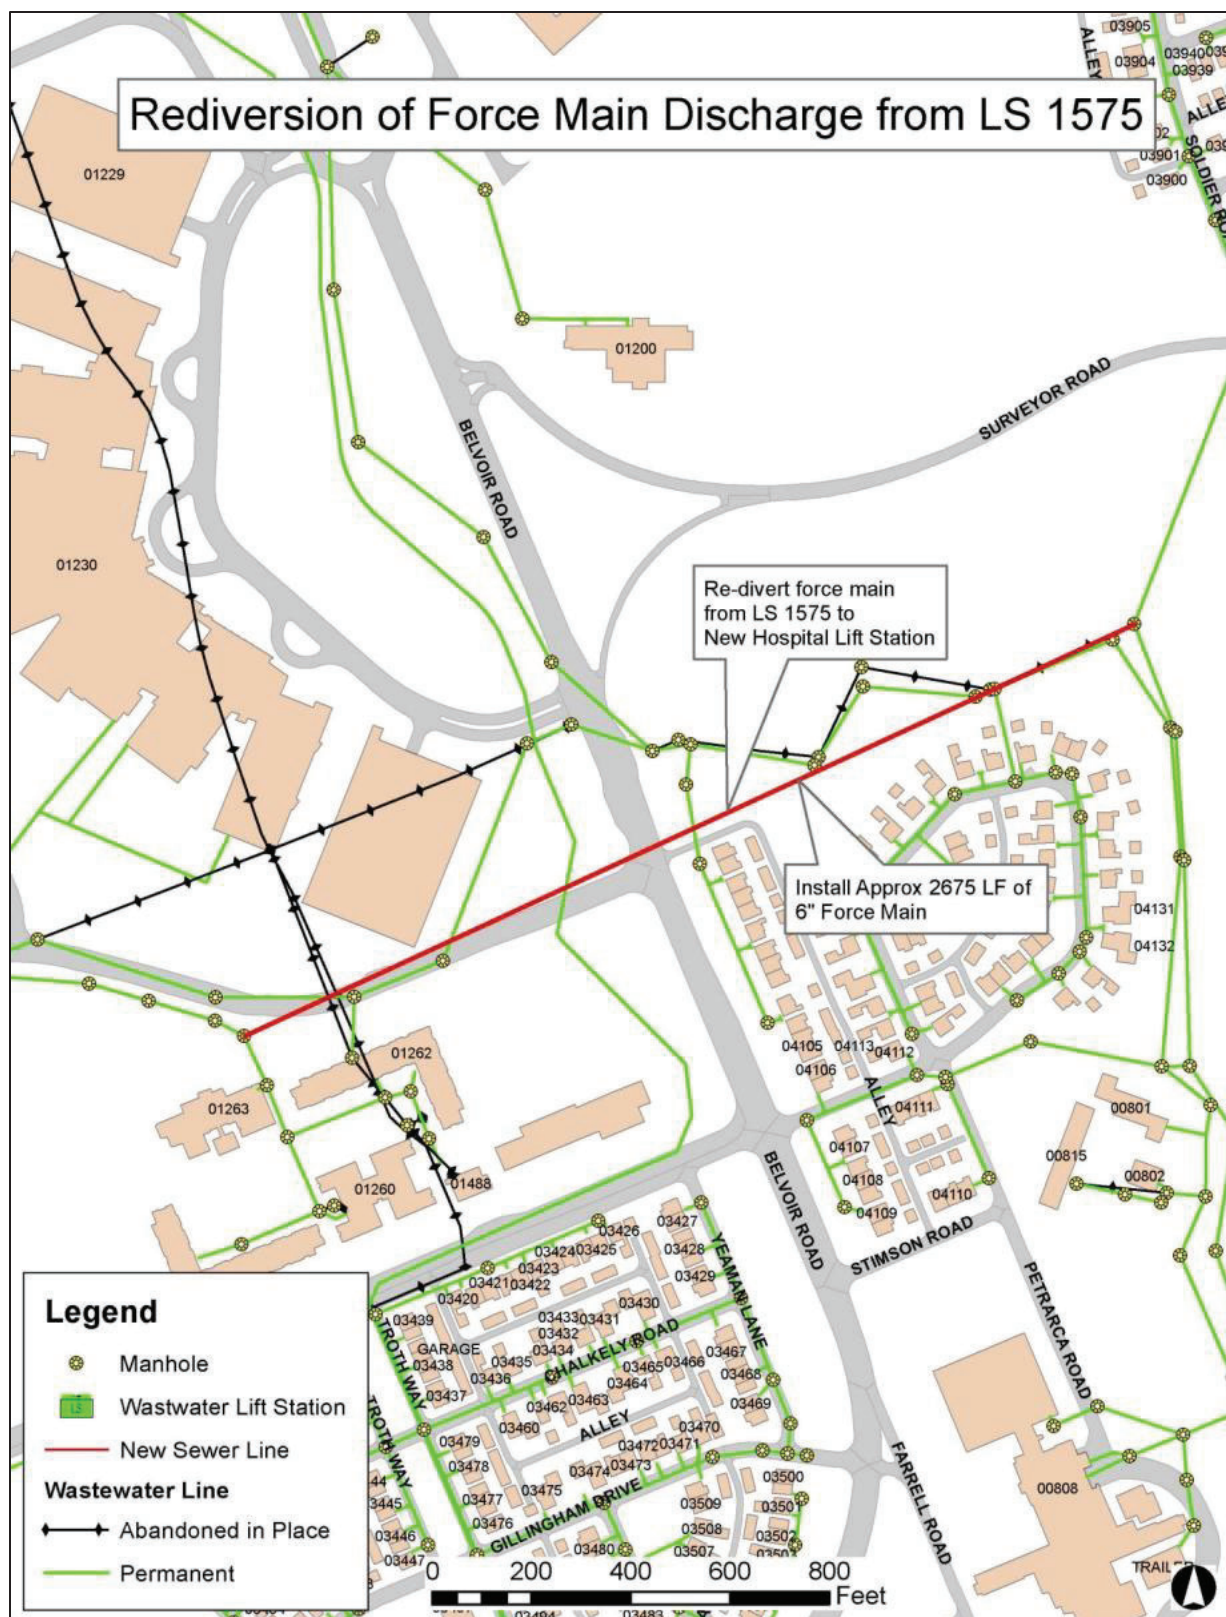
Rediversion of Force Main Discharge from Lift Station 1575 Site Plan
